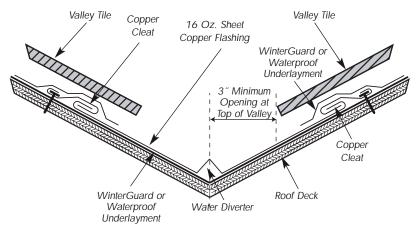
Cross Section Showing Valley Flashing on Wood Roof Base
